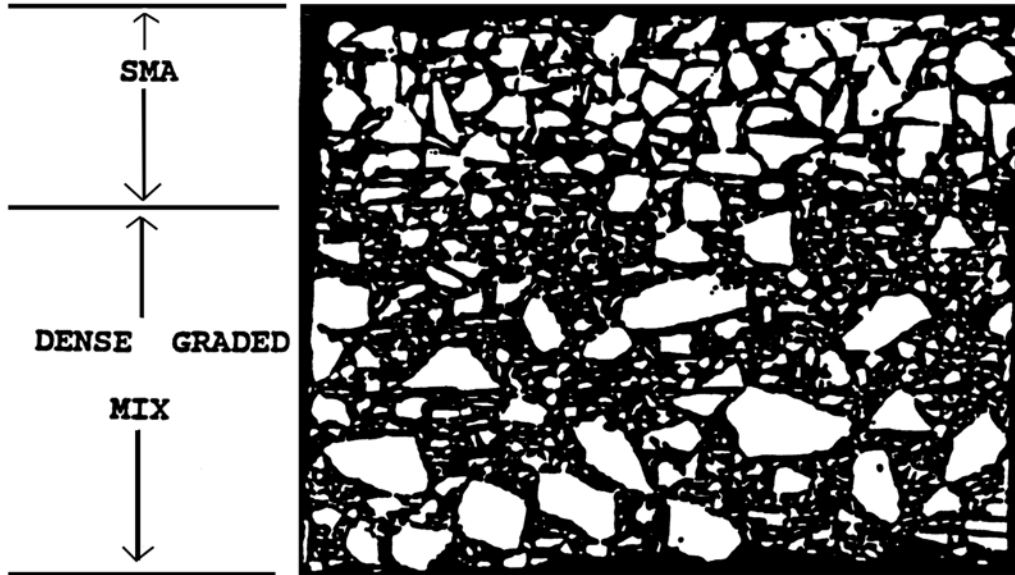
Pavement Section with a Stone Matrix Asphalt (SMA) Surface Course over a Conventional Paving Mix (Z)
